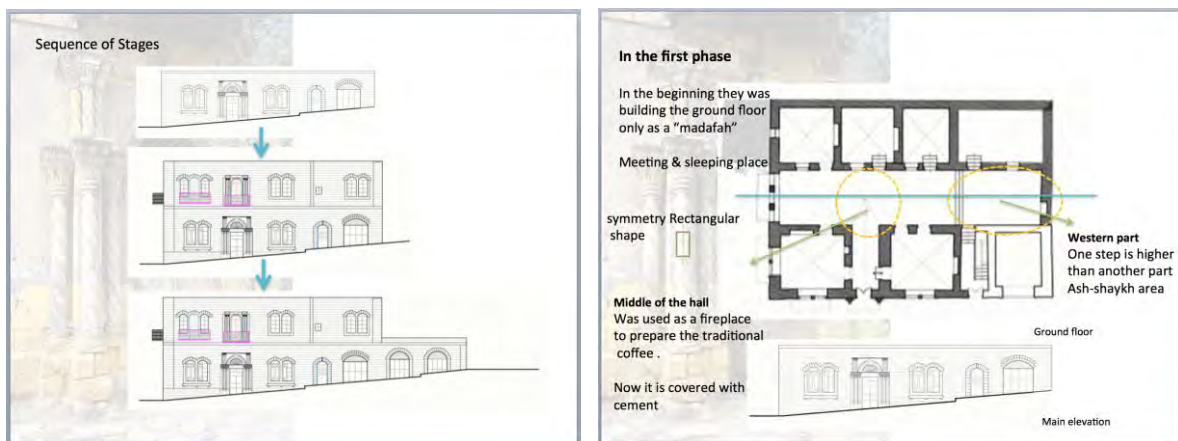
Prepared example of drawings of restoration (left: transition of elevation surface in three phases, right: plan in the ground floor)
